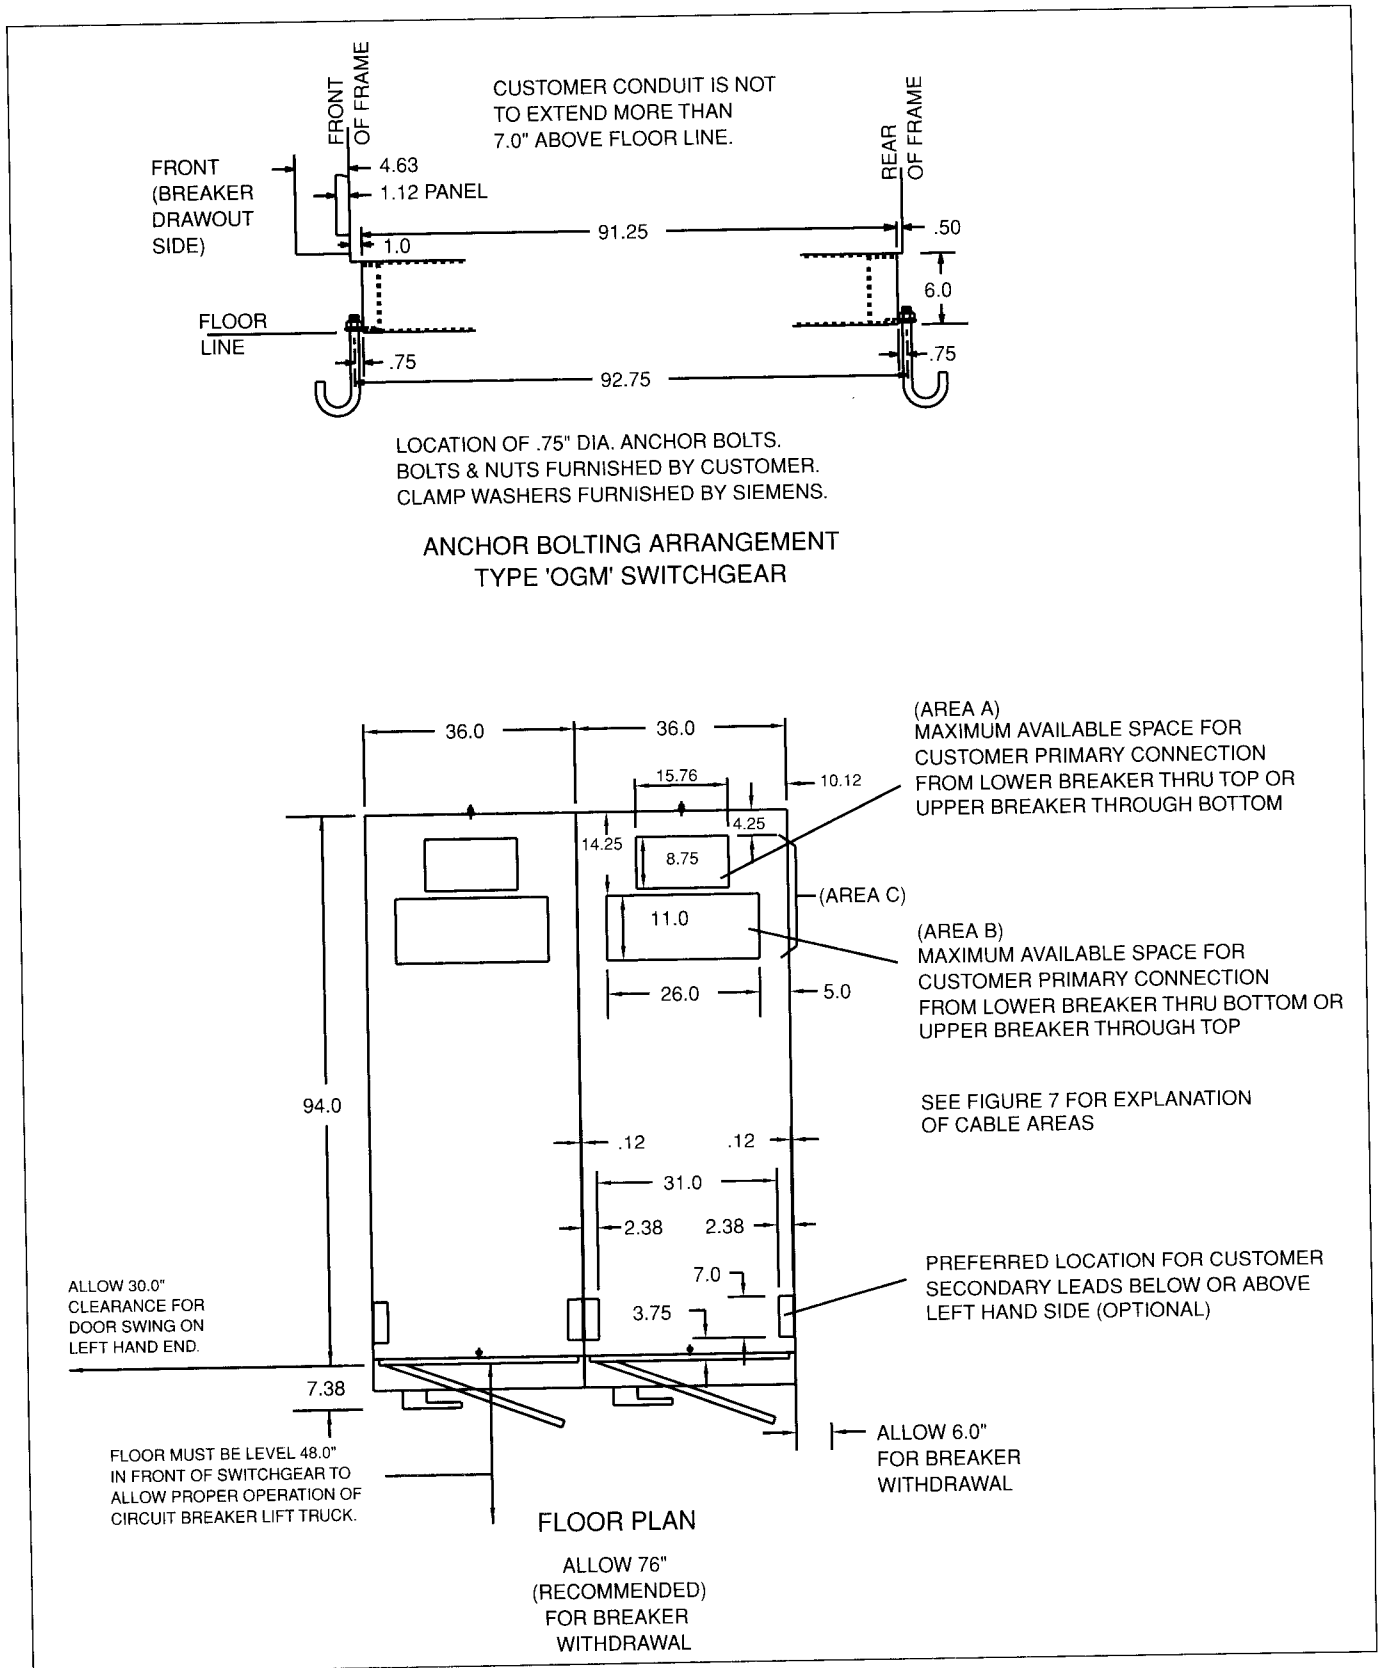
Anchoring Outdoor OGM Non-Walk-In Switchgear
